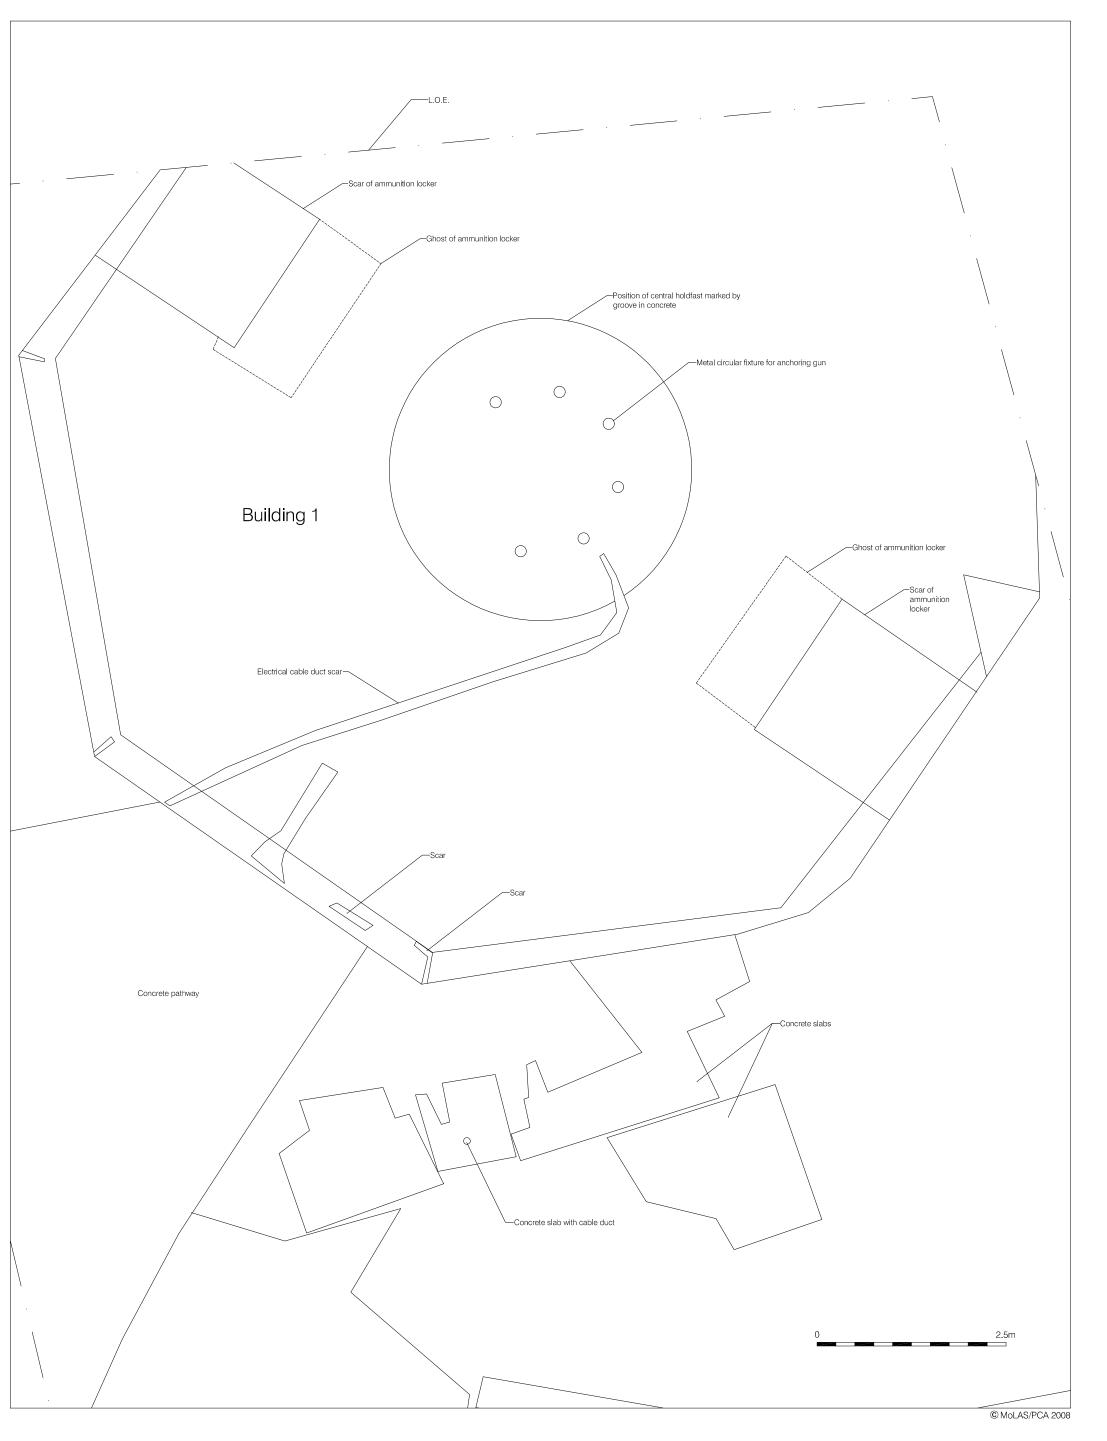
Building 1, north gun platform, plan 1:50 at A3
